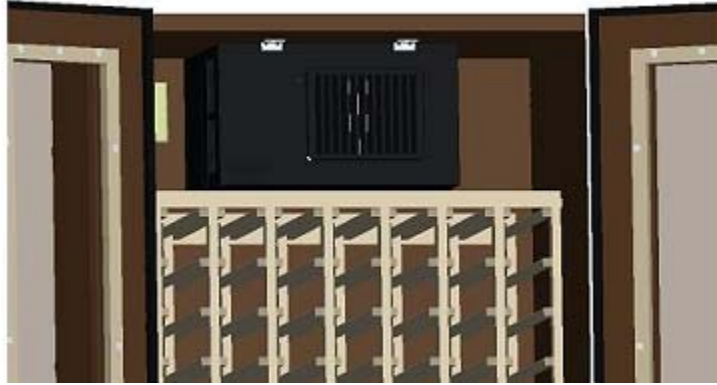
COOLING UNIT MOUNTING (COMPLETED)
